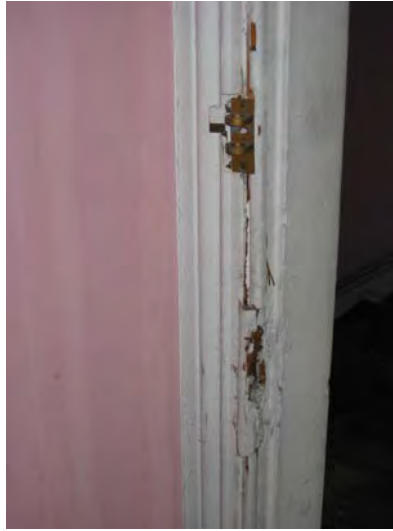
Damage to door frame D303A. (Photo: BBB, 2007)
